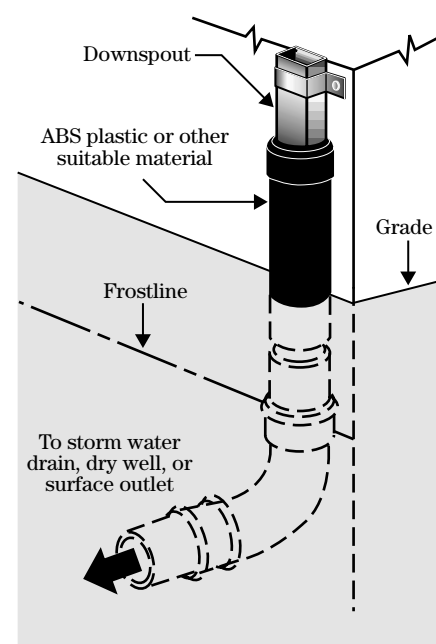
Roof water can be routed away from the foundation or basement walls to a storm water drain or other outlet using non-perforated pipe
